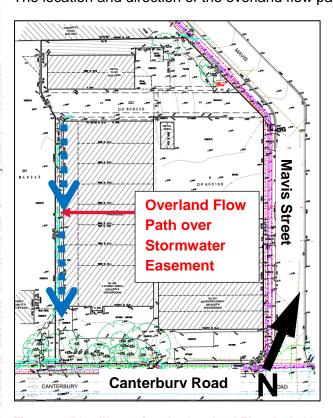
Plan Illustrating the Overland Flow Path Above the Stormwater Easement.
